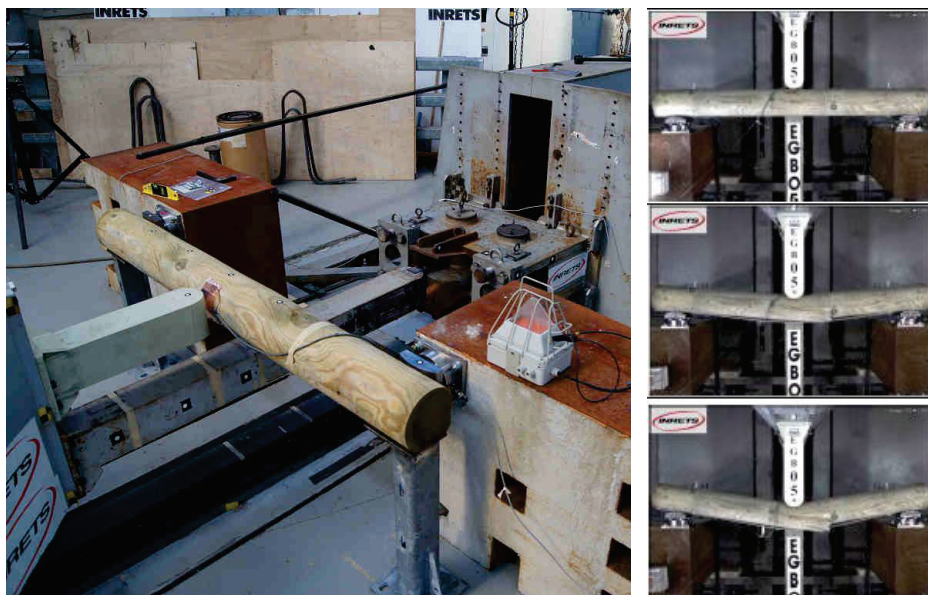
7 Bending test of steel reinforced wood beam [49]
